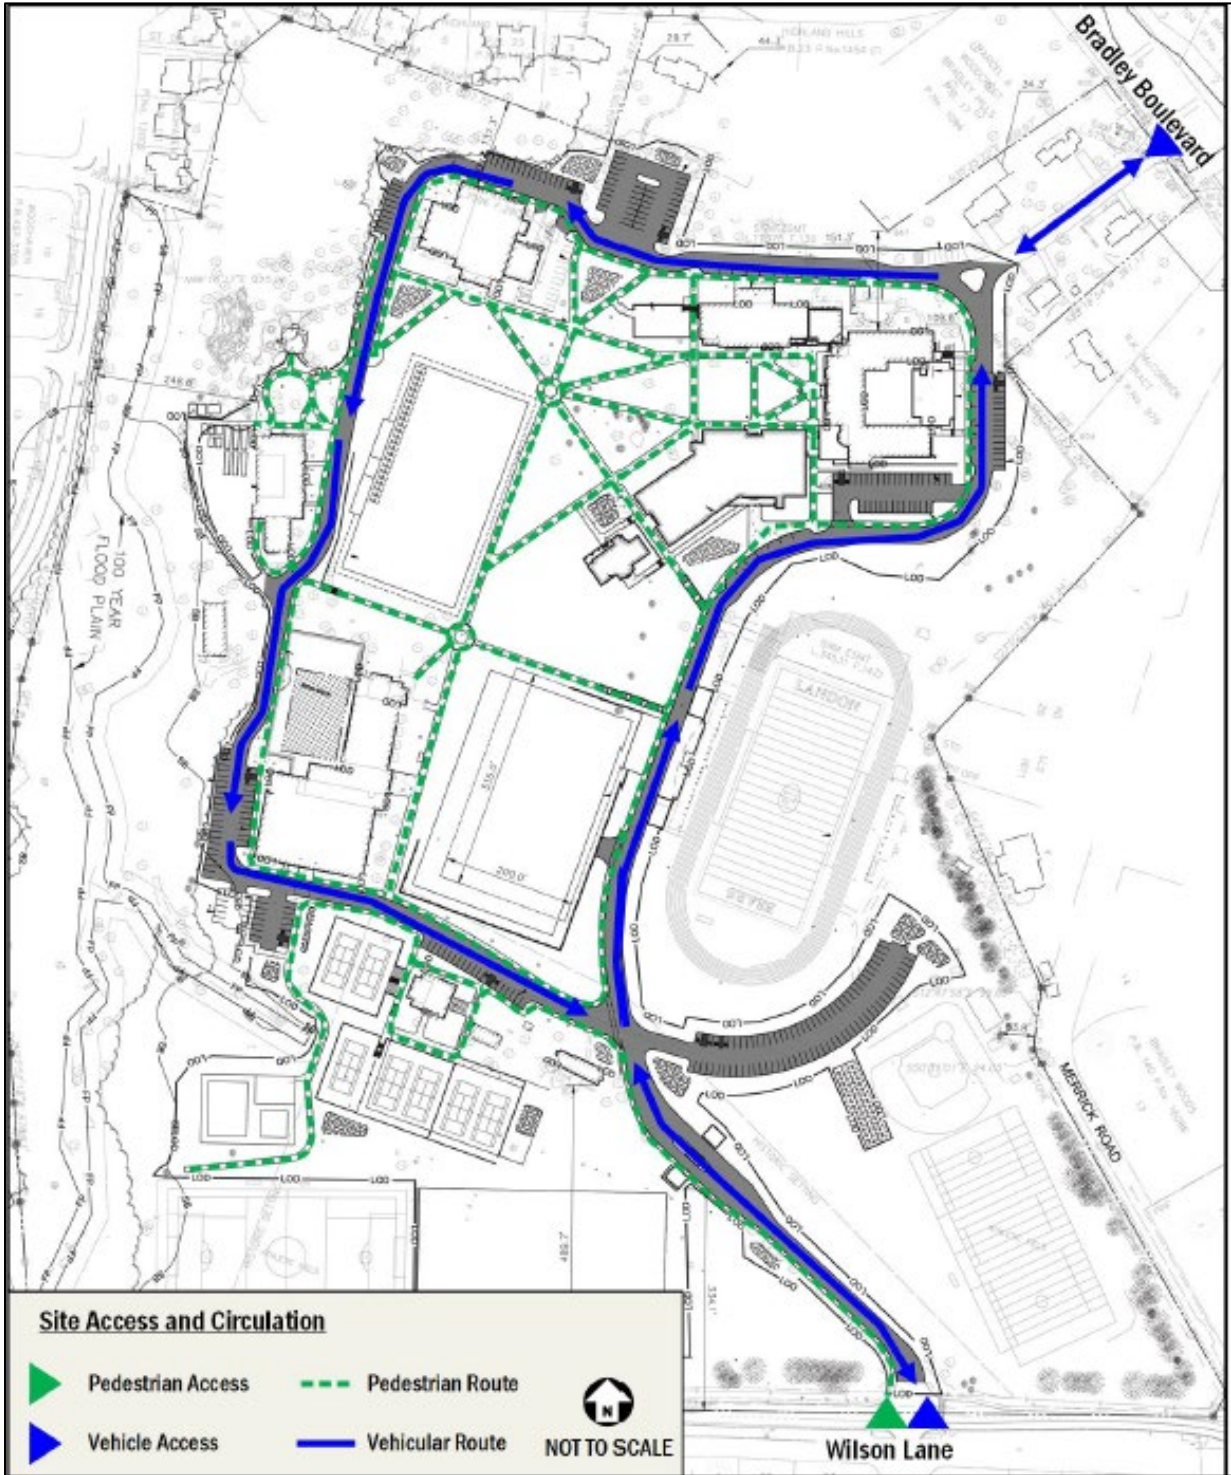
Proposed Site Circulation at Full Build-out of the Campus Master Plan
